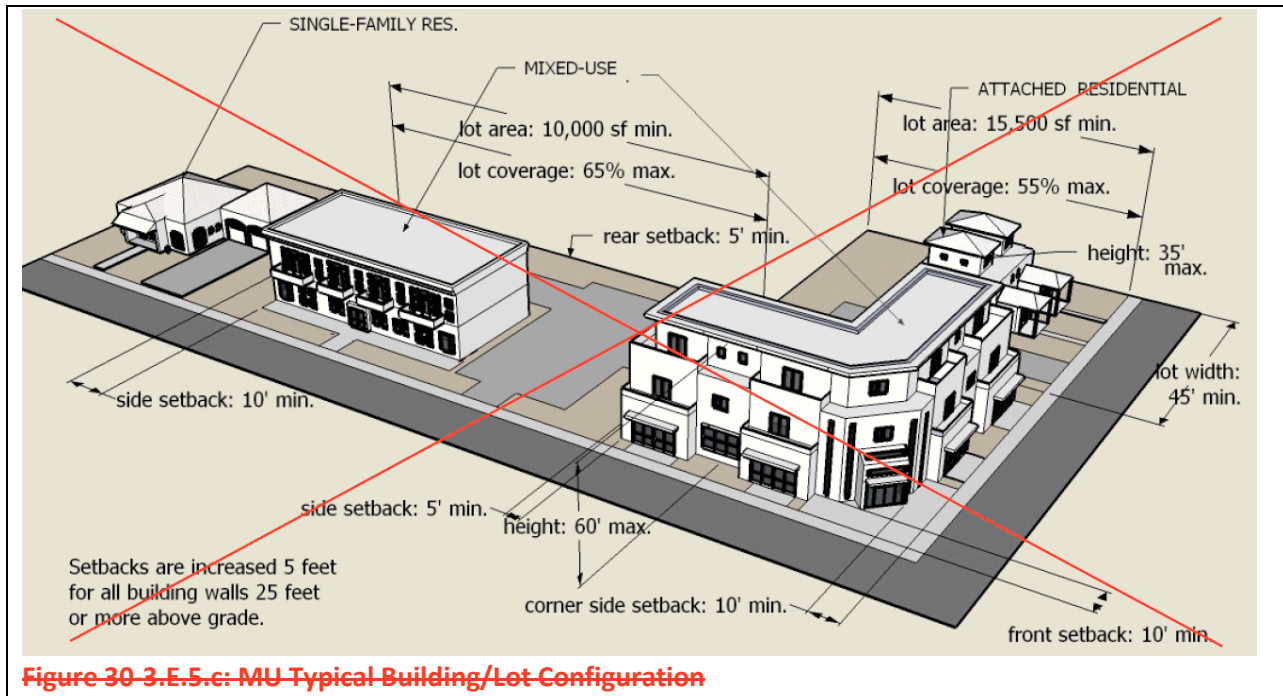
E.5.c: MU Typical Building/Lot Configuration
